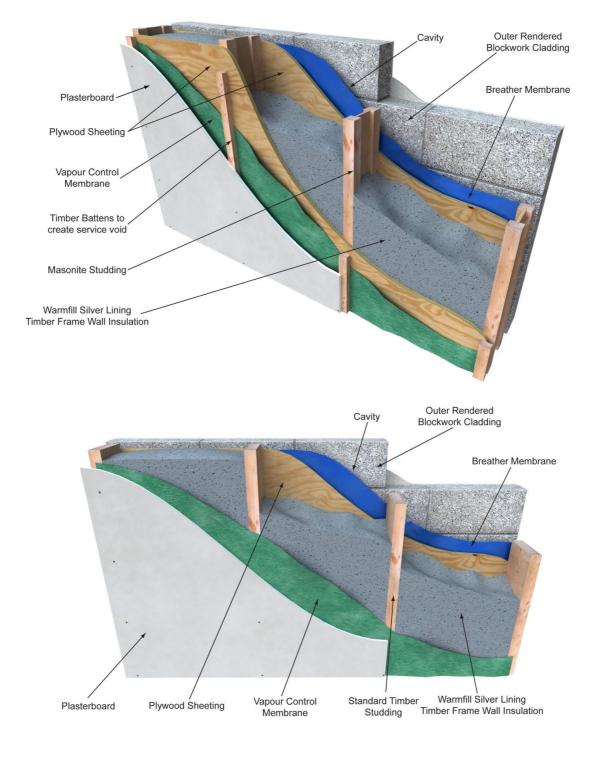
Warmfill Silver Lining System in Typical Timber Frame Constructions
